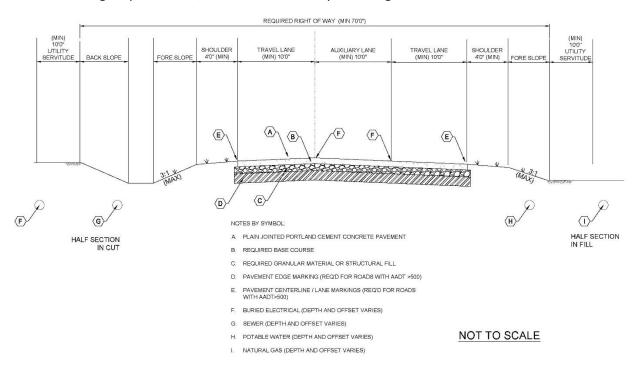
Cross Section Elements and Requirements for Uncurbed Roadway, 3-
